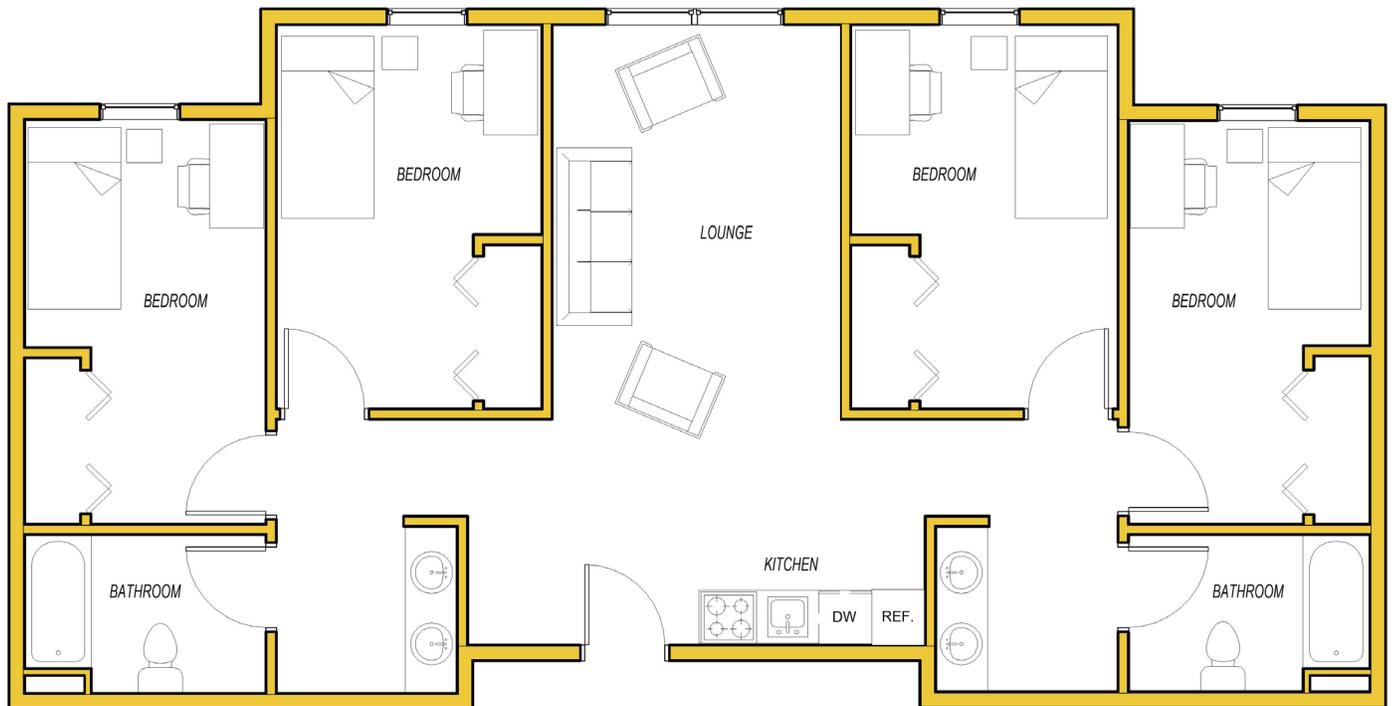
Four-Bedroom Apartment (Private Bedrooms)
